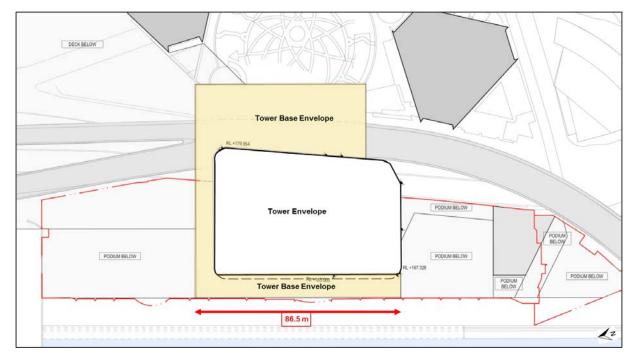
| Tower base building envelope and width (Base source: Applicant's RtS)
